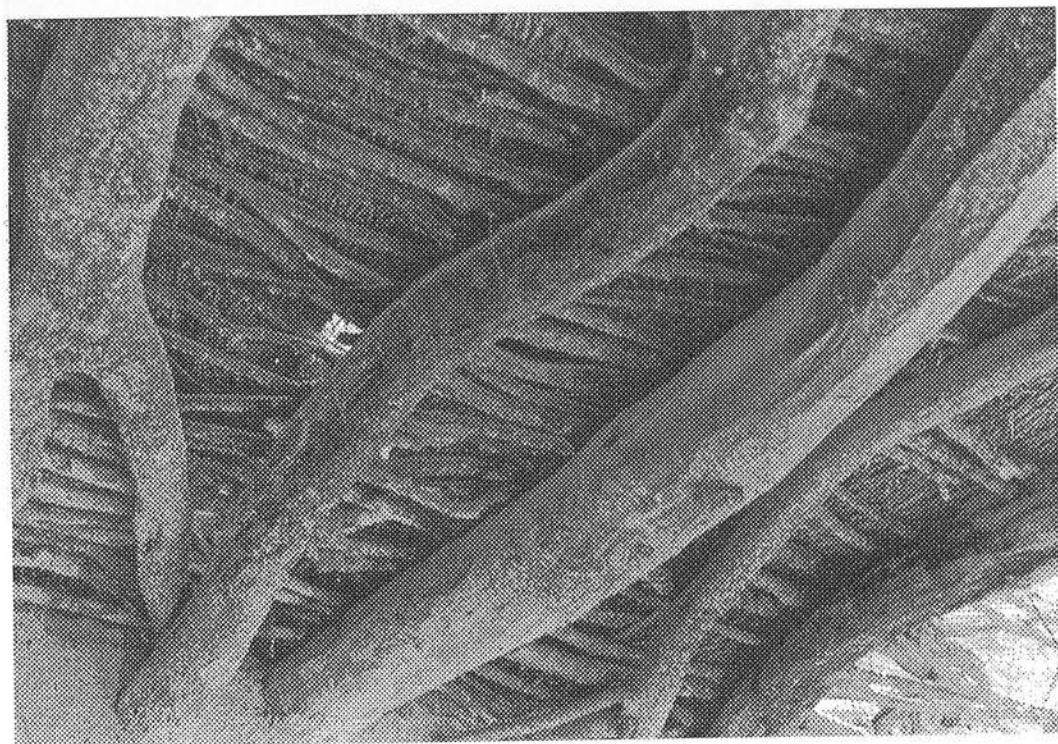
House 162/1 view of interior rafters in ground floor room.
